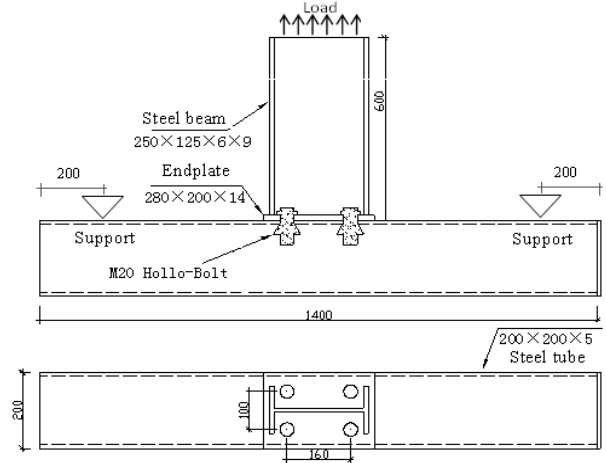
Configuration details of the blind-bolted endplate connection for a steel beam-CFST column joint
